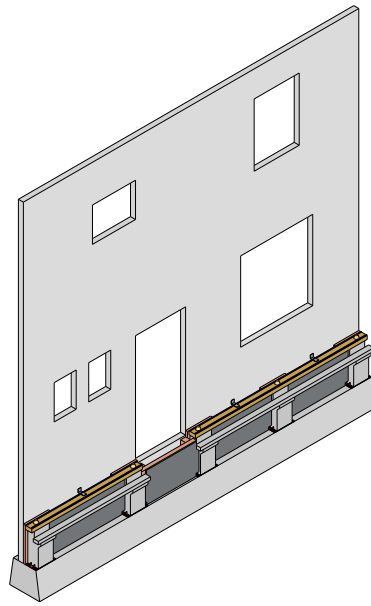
See through image of façade elements and placement of connections (own image, 2025)
